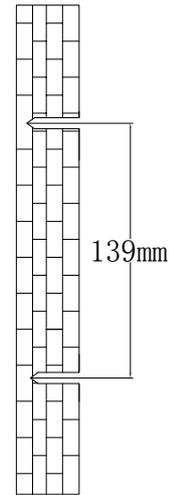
→ Drill two holes of 6.00mm diameter: if you install the heater upright above the sink, the distance between every two holes is 156mm; if you install the heater downward under the sink, the distance between every two
